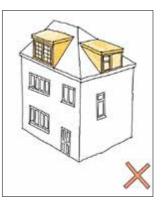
Getting the architectural detail right will be critical for features such as dormer windows
